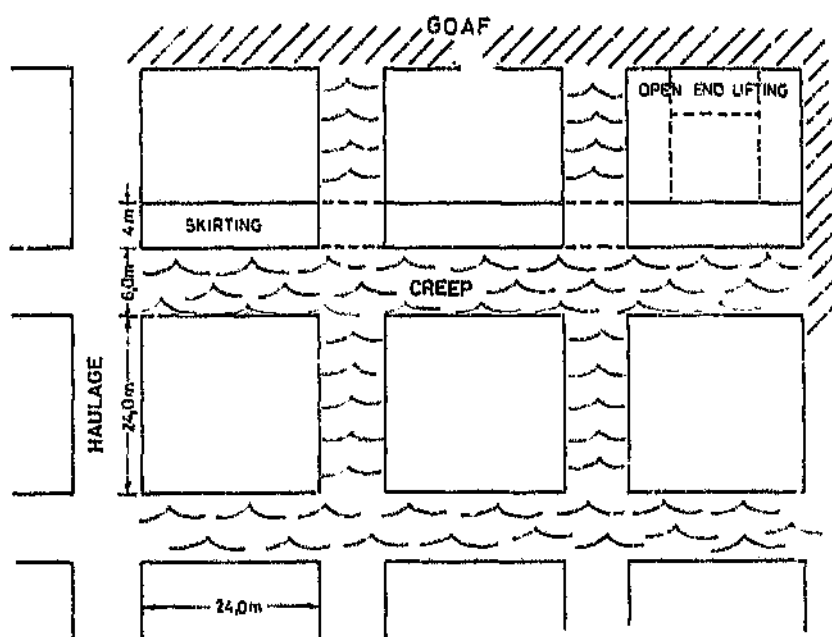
Skirting of Pillars where Floor Heave Is a Problem
